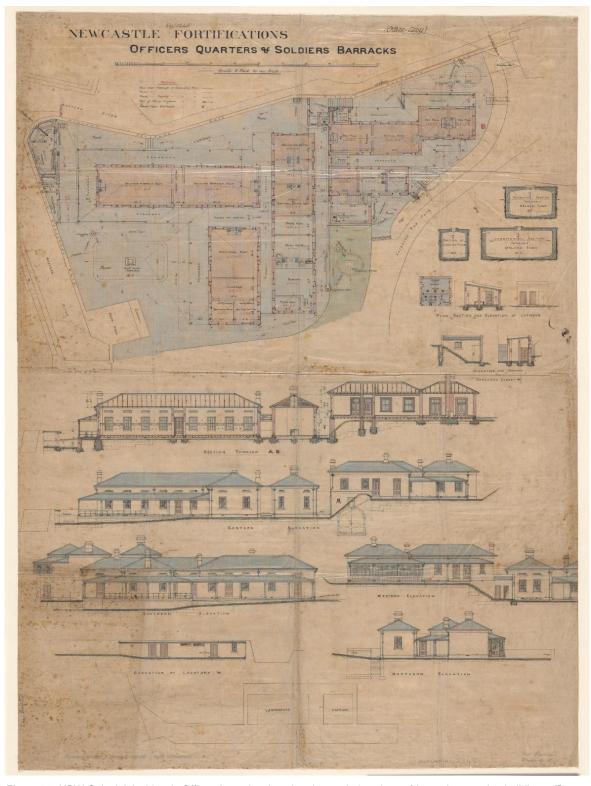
NSW Colonial Architect's Office plans showing site plan and elevations of barracks complex buildings. (Source: Newcastle Fortifications, Office Quarters & Soldiers Barracks, c.1884, NSW Colonial Architect's Office. Museums of History NSW, NRS-4335-9-[Plan2348]-84/1248)
